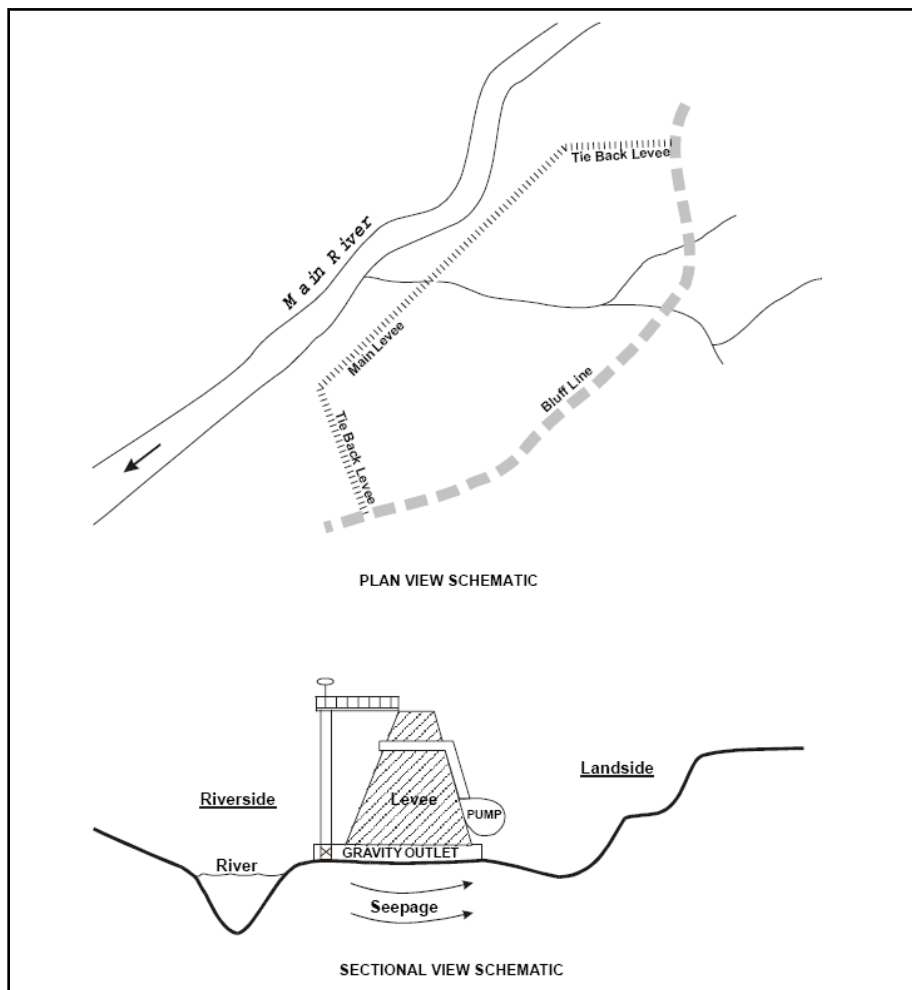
Plan View and Section View of Traditional Level/Floodwall System
